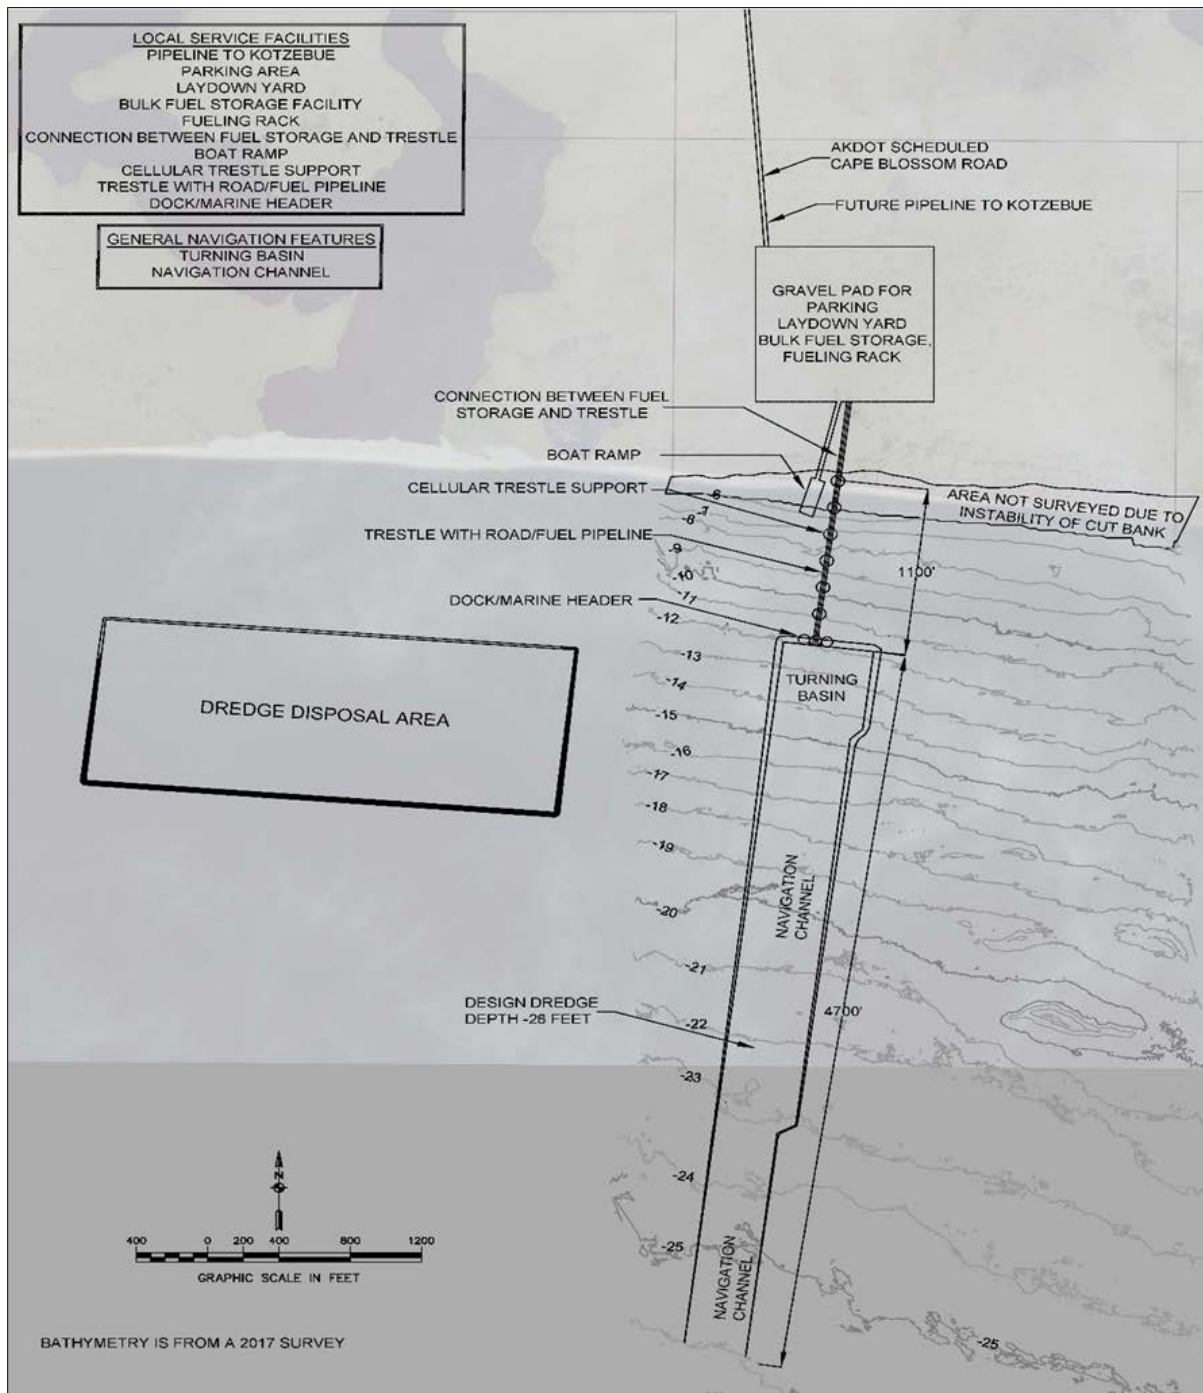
Alternative 7 - TSP Plan View Concept Drawing
